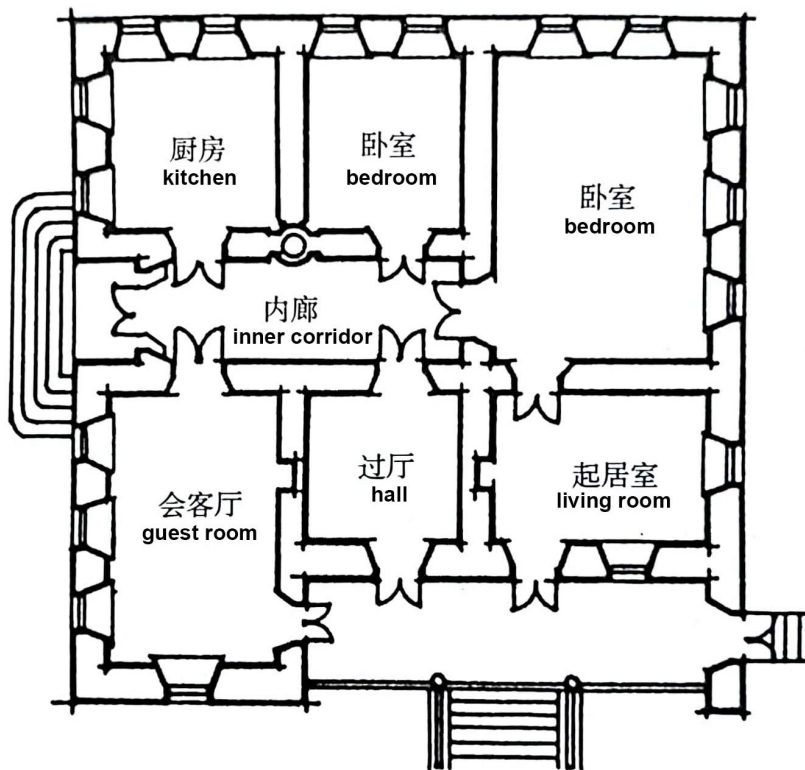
Floor plan of an example cluster-style house.³⁸ Translated by author.
